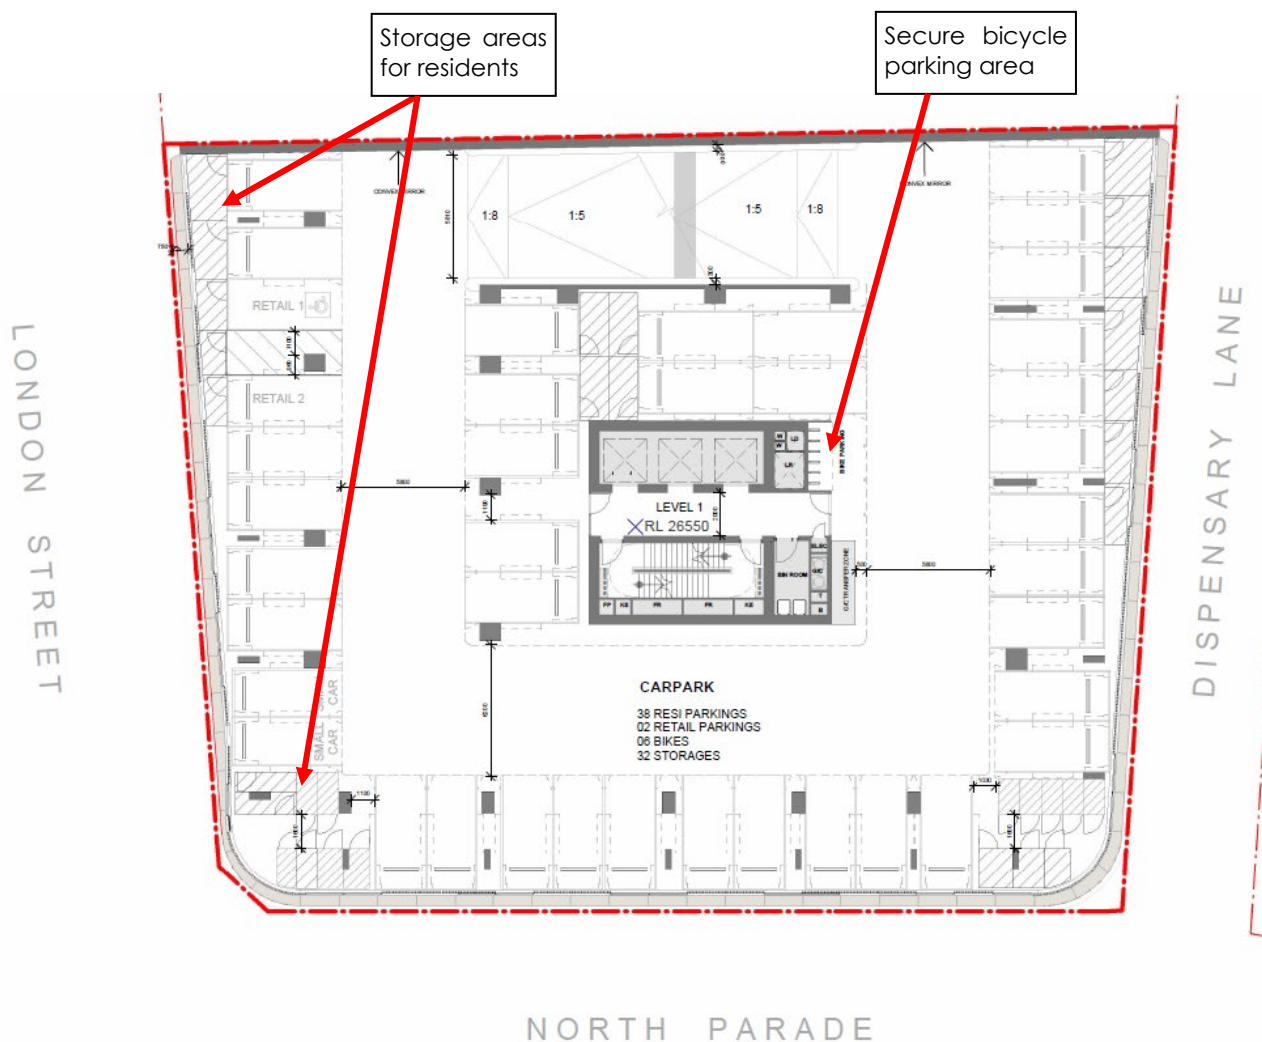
Extract of Level 01 Floor Plan (Woods-Bagot, 2026)
